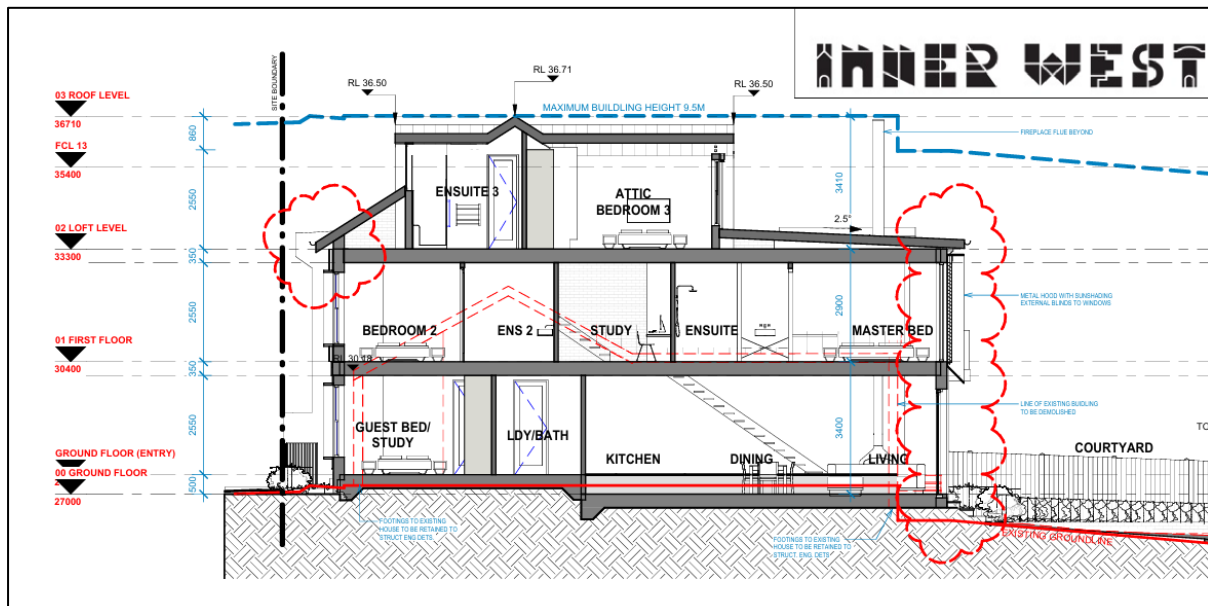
No. 26 Eton Street Section Diagram as Approved under DA/2021/1080
